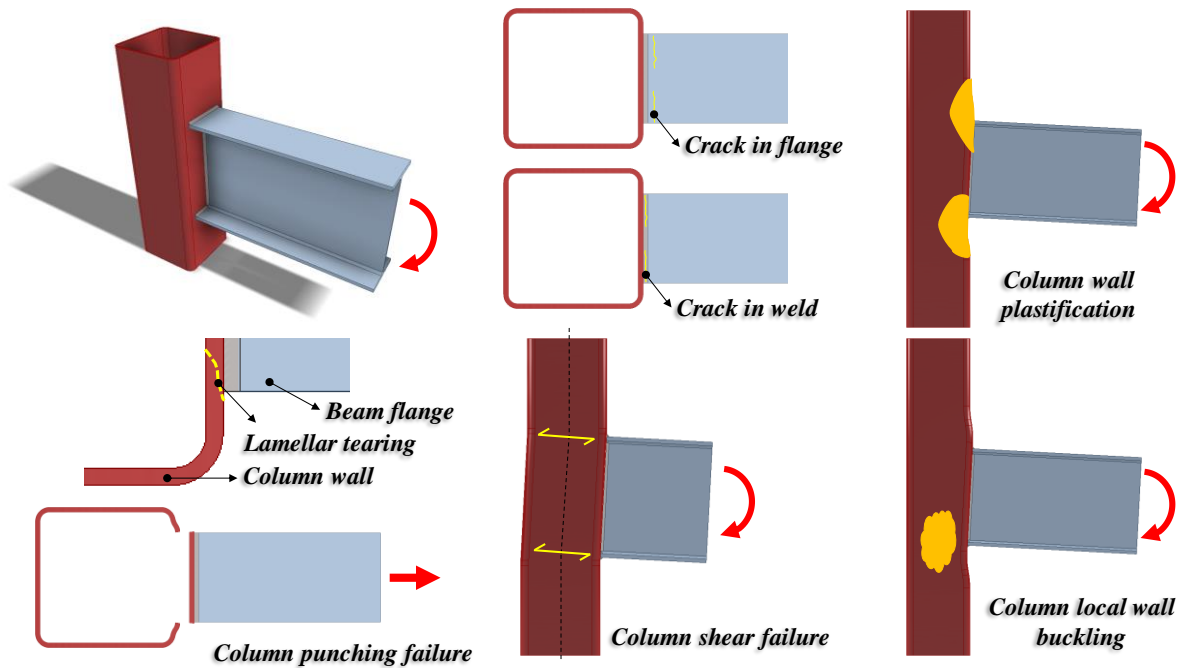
Modes of failure for I beam-to-RHS column joints
